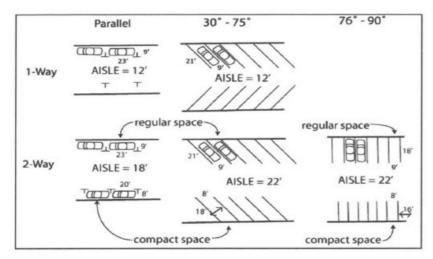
A - Off-Street Parking Space and Aisle Dimensions
